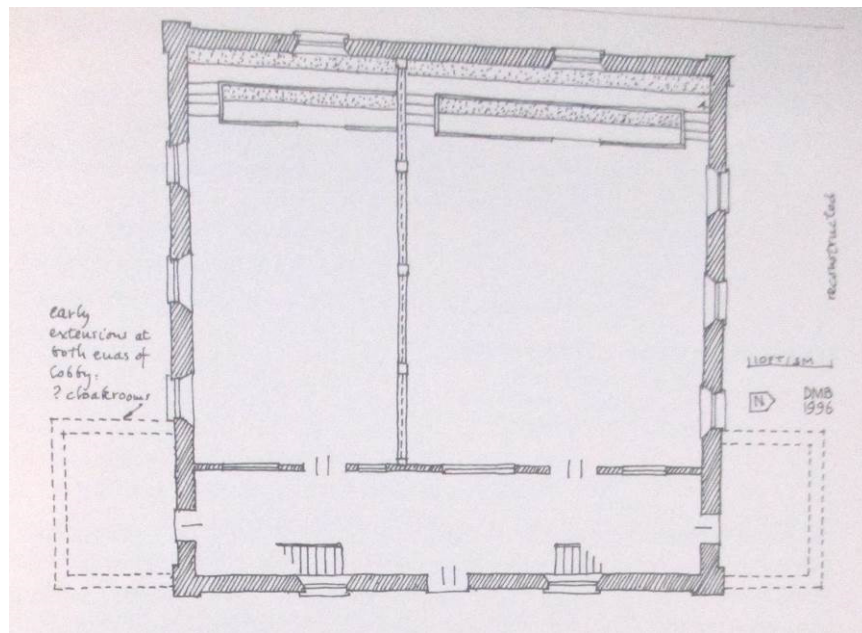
Plan of the 1823 Meeting House (from Butler, Vol. 1, p. 169)
